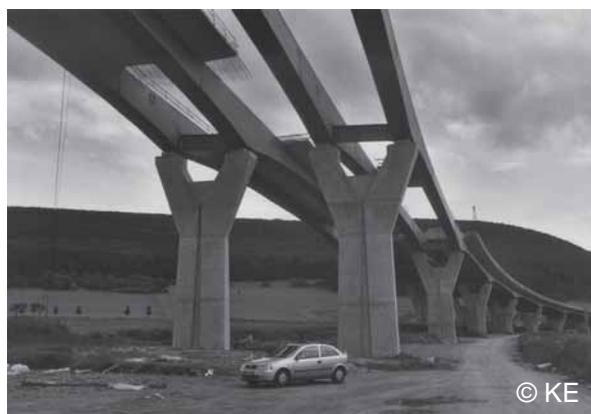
Valley bridge Nesenbachtal, Stuttgart, Germany, 2000.
